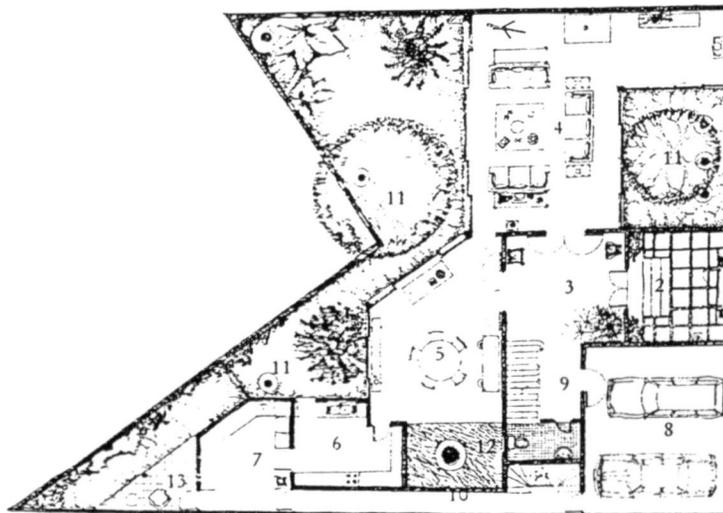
Ground Floor Plan of Jayakody House Source: Tropical Urban House
